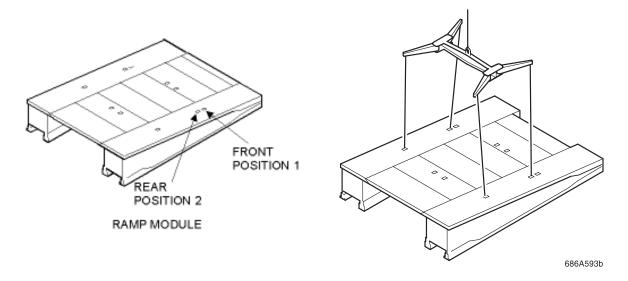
48 Bridge Lifting Beam connected to POSITION 2
